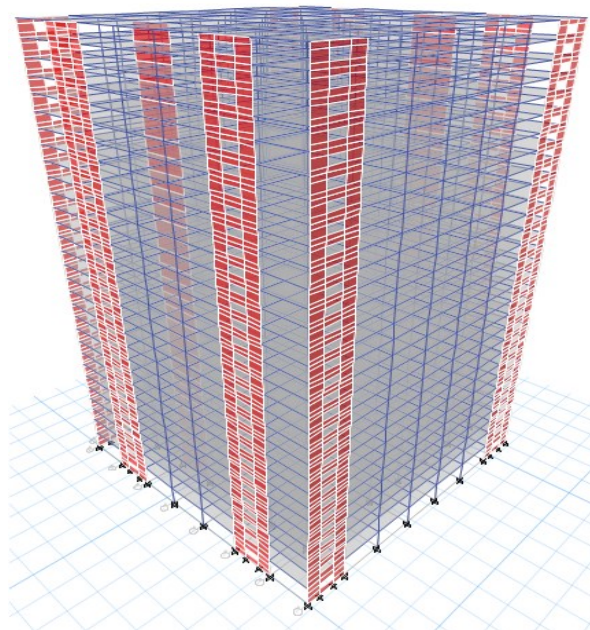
Model 2: Shear Wall with Opening at Centre (3mx1.4m): 3D view
